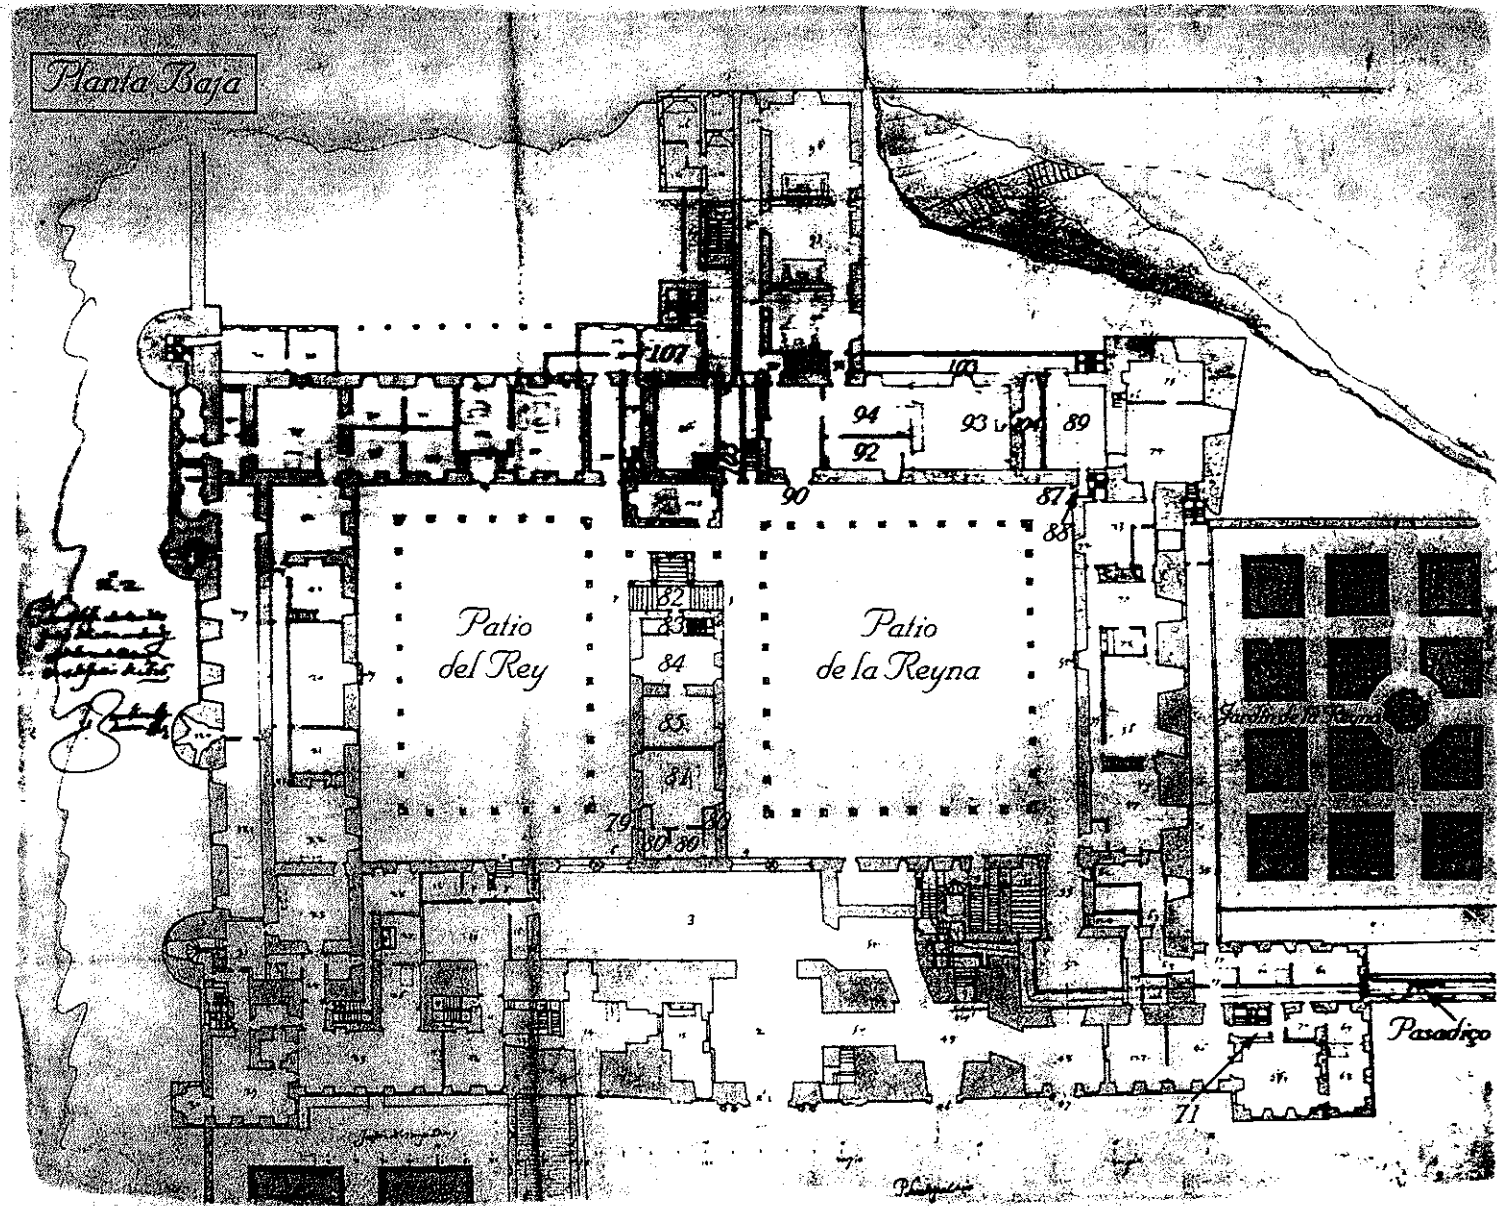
Floor Plan for the Lower Floor (*Planta Baja*) of the Real Alcázar in Madrid, designed by Juan Gómez de Mora, 1626 (Foto Biblioteca Vaticana).
